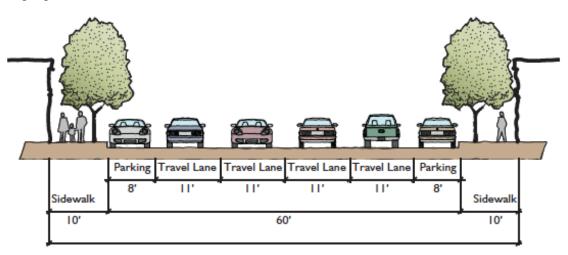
Cross Section for Preferred Streetscape Alternative (1st Street to 6th Street)
